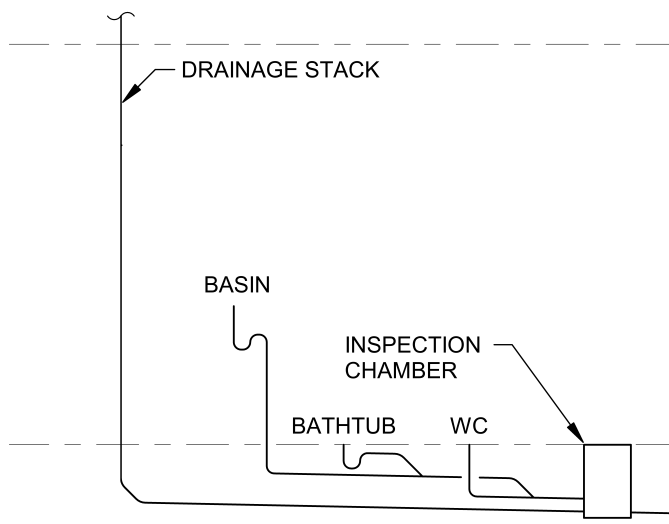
Inspection chamber for lowest floor fixtures
